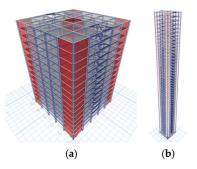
(a) G + 15 Framed Structure without shear wall Opening 3D Model; (b) G + 50 shear wall with opening 3D Model Case-1.
